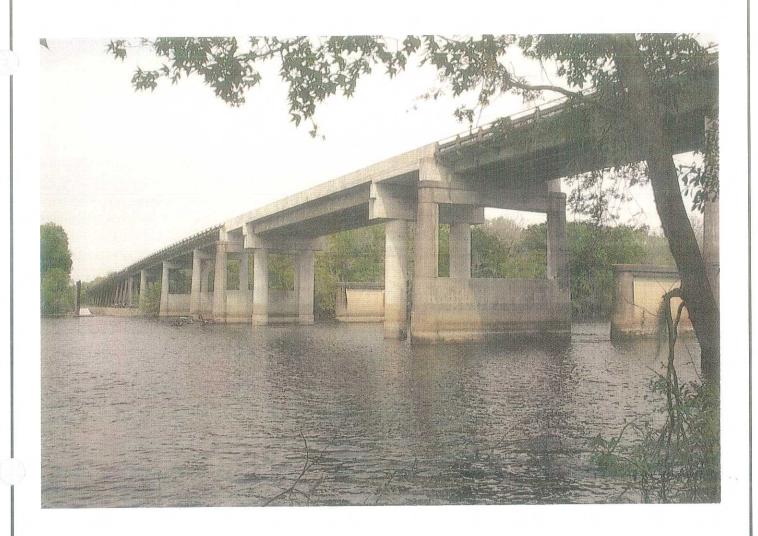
View of existing PeeDee River Bridge (Bridge 2) from upstream. Bridge is supported by cast-in-place concrete piers extending below the scour line, in turn supported on timber piles extending approx. 15-30 ft below the base of the piers. The central span was constructed in about 1996 and is supported by drilled shafts bearing in Pee Dee Formation at a depth of about 40-50 feet below the mudline. Piers in river channel beyond the existing bridge were part of old structure that was demolished when the current bridge was built in 1952.
